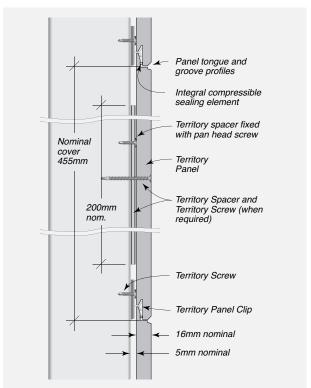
Typical System Cross Sectional Detail where Face Fixing is required – Steel Frame – Elevation
